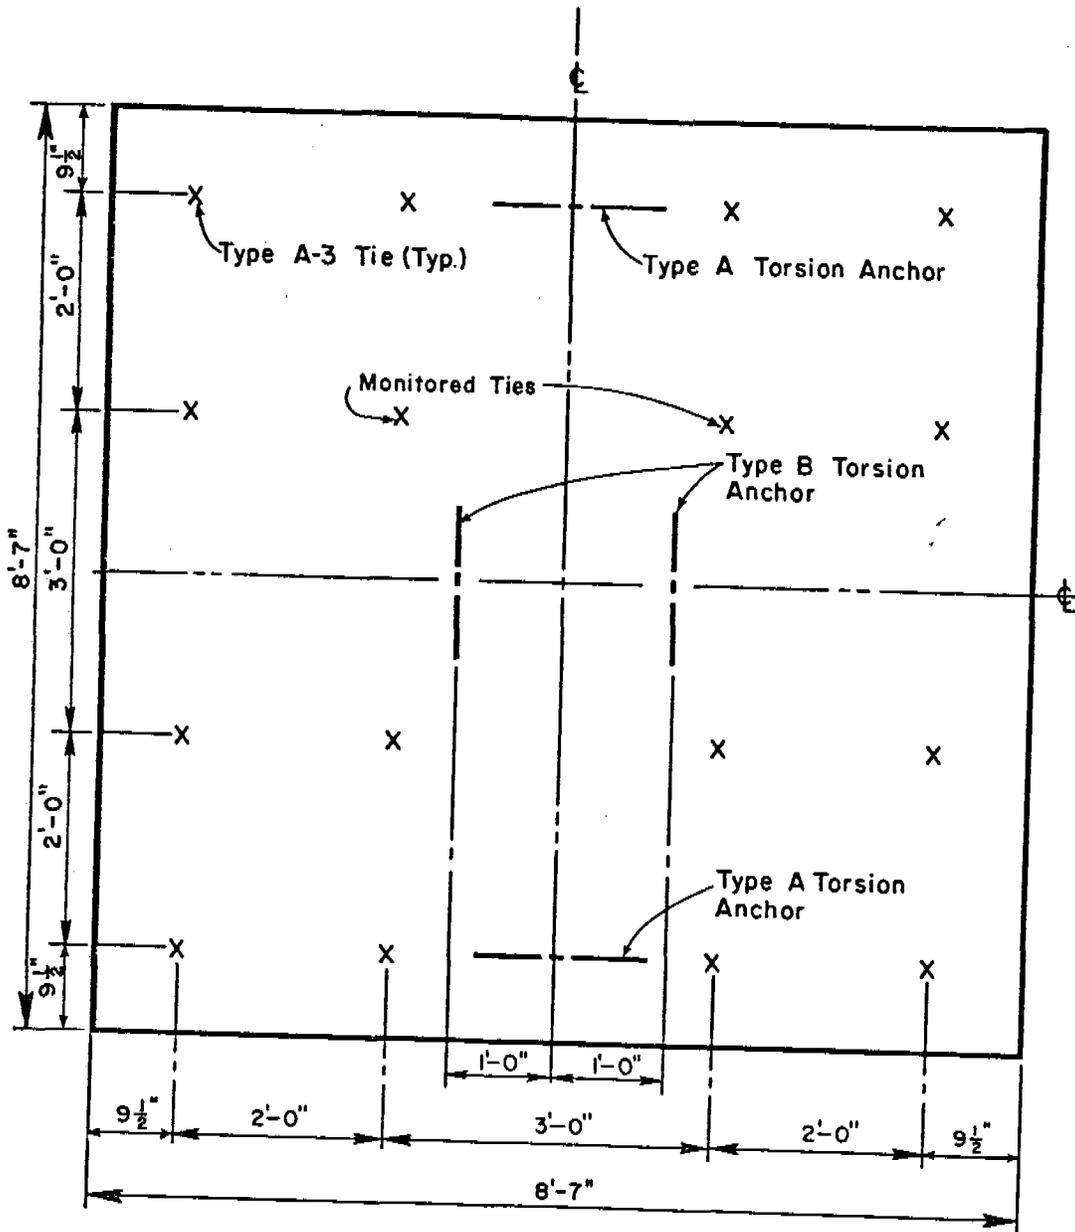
Location of Stainless Steel Torsion Anchors and Ties in Wall P2
